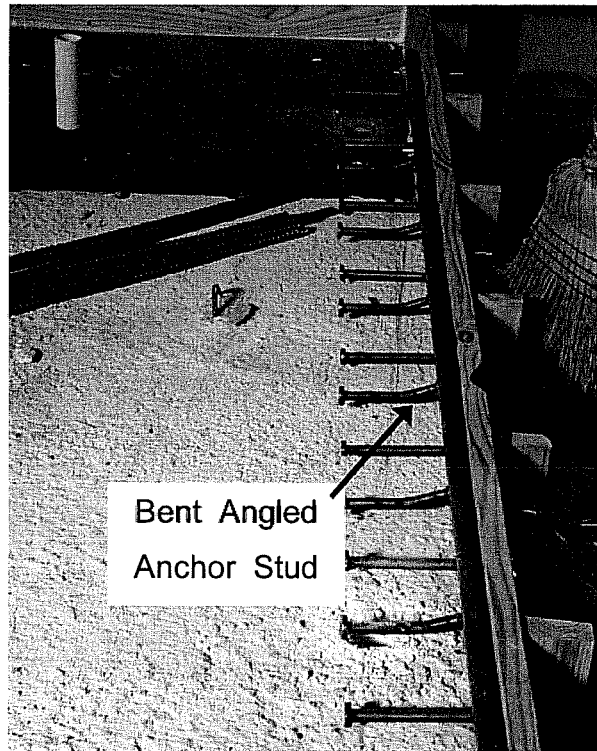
Bent angled anchors on sealed expansion joint rail
